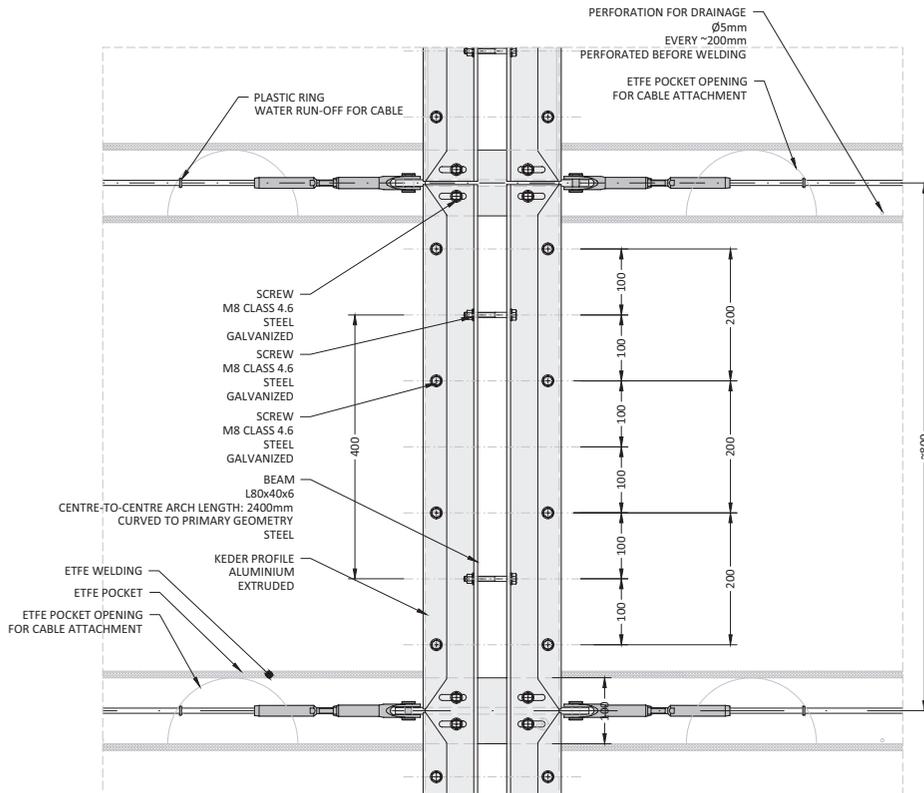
ETFE façade panel clamping detail – elevation; source: LEICHT
